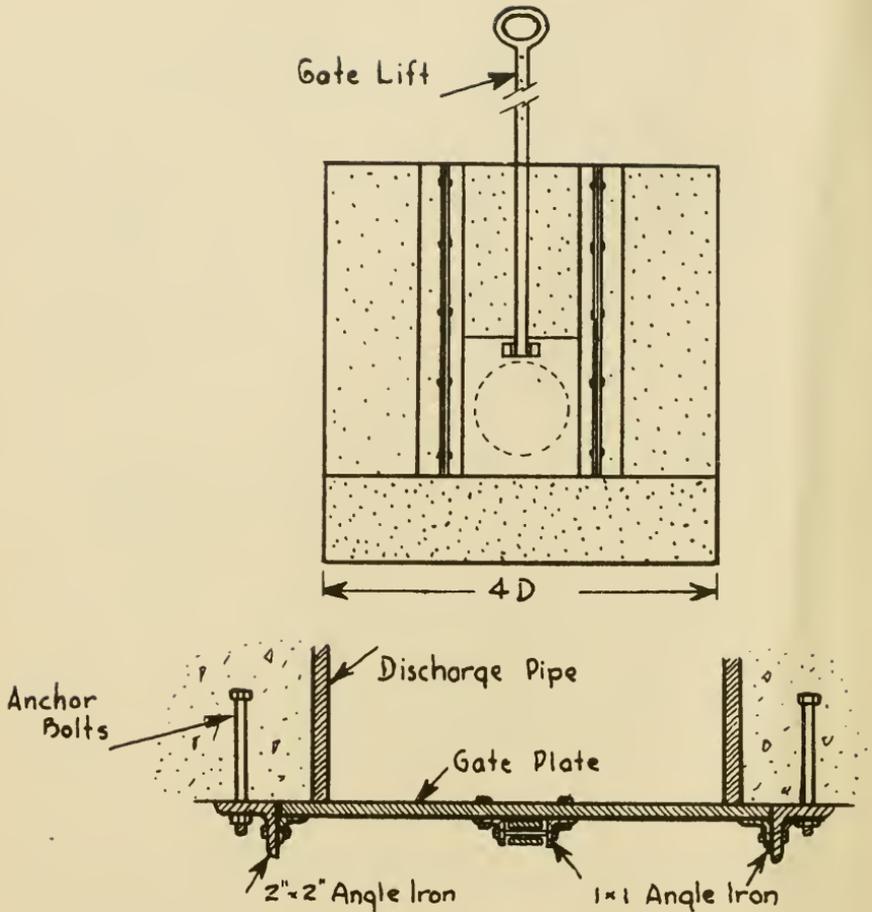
An inexpensive pond outlet gate which can be constructed with materials on hand.
